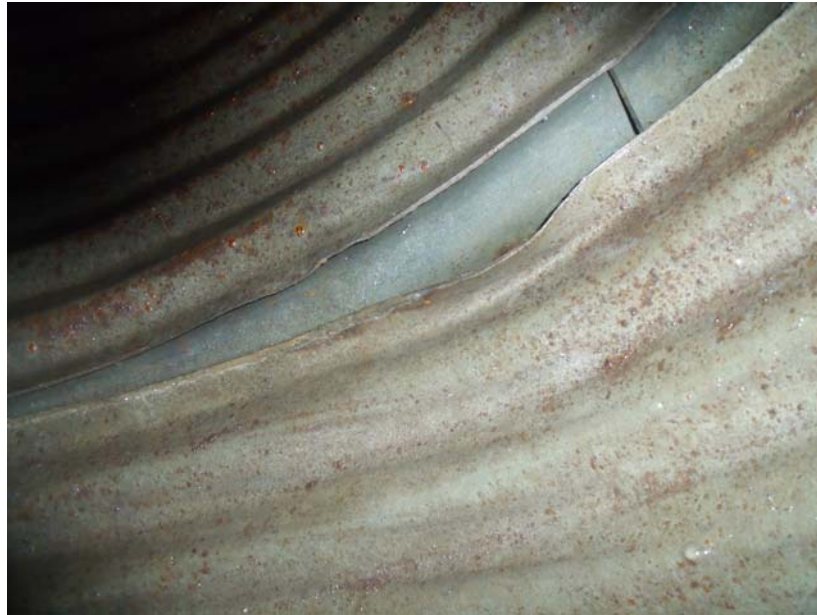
Open Joint 1 – Looking west from middle of pipe showing extent of opening
